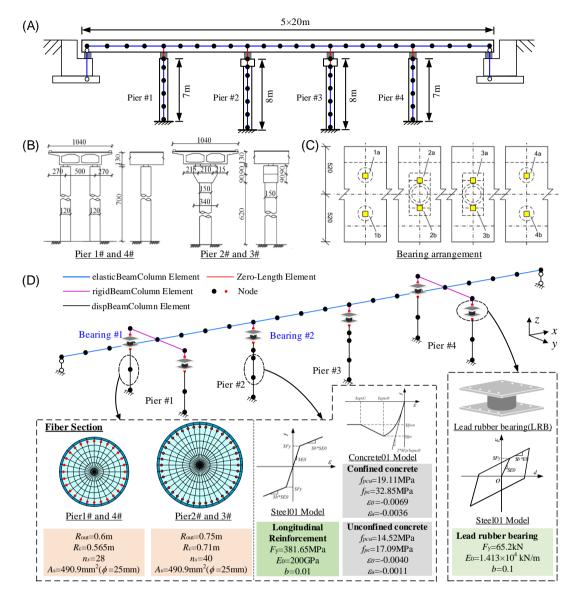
Layout and FE model of the isolated continuous girder bridge.
